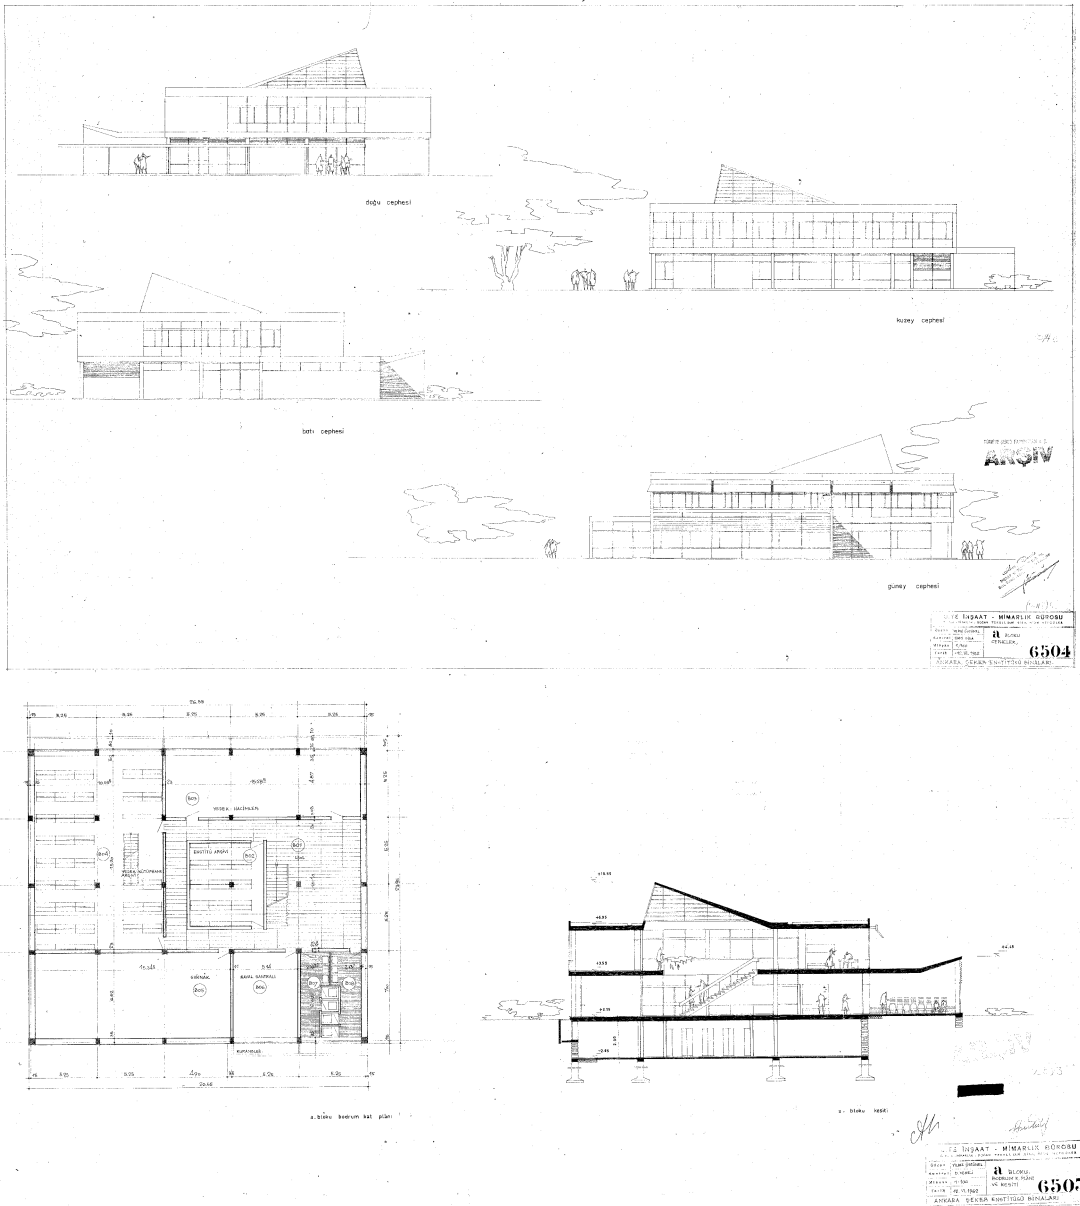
6: Sugar Research Institute, Facades View, Plan and Section (TOBB ETU Architecture Department Archive).
